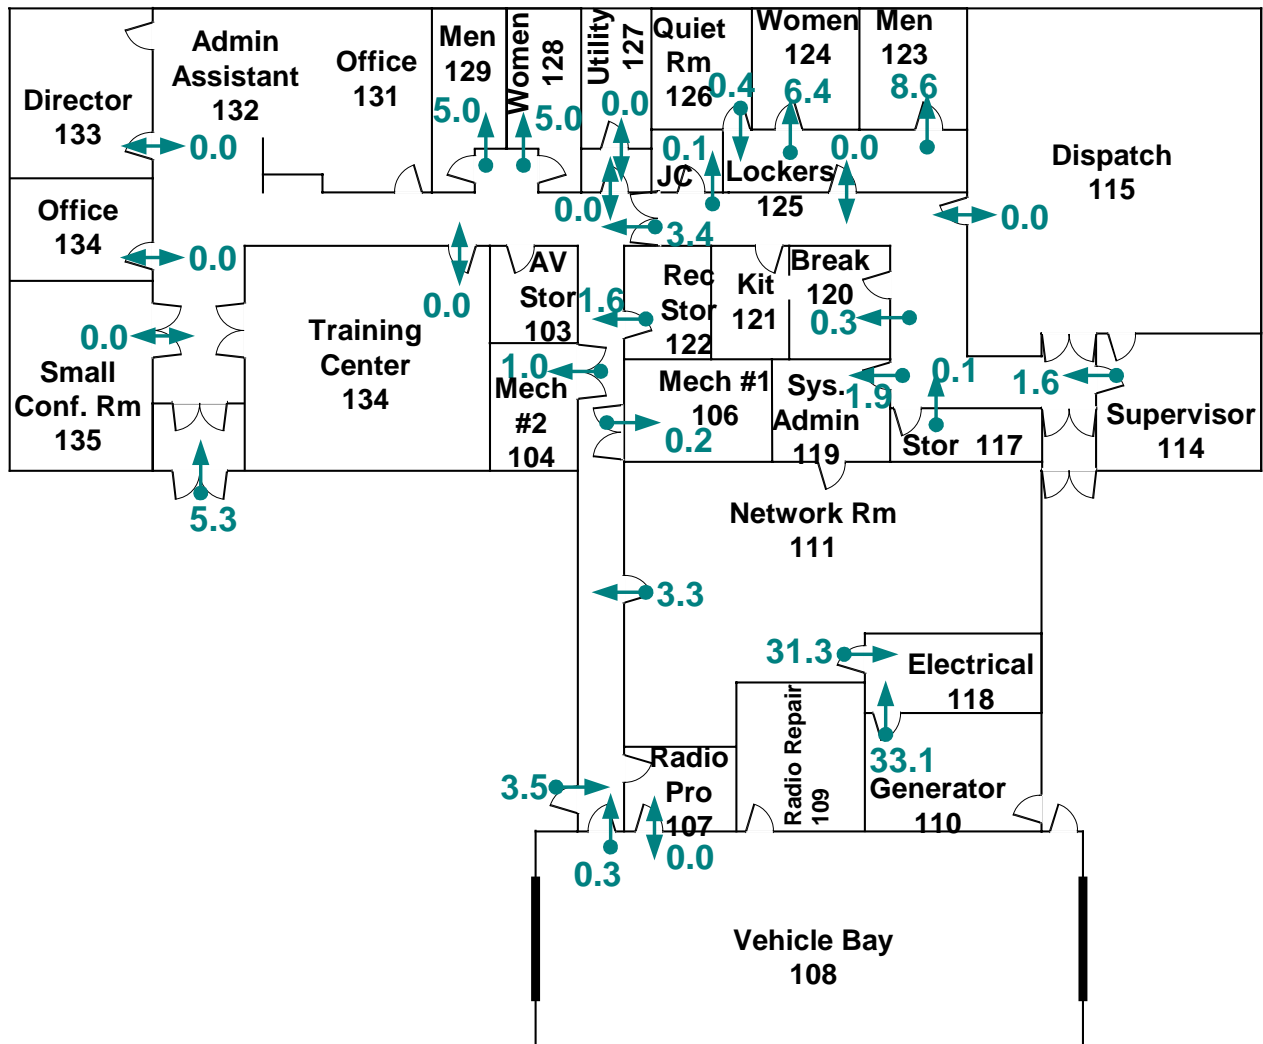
First Floor Pressure Differences between Rooms with AHU Fans On
